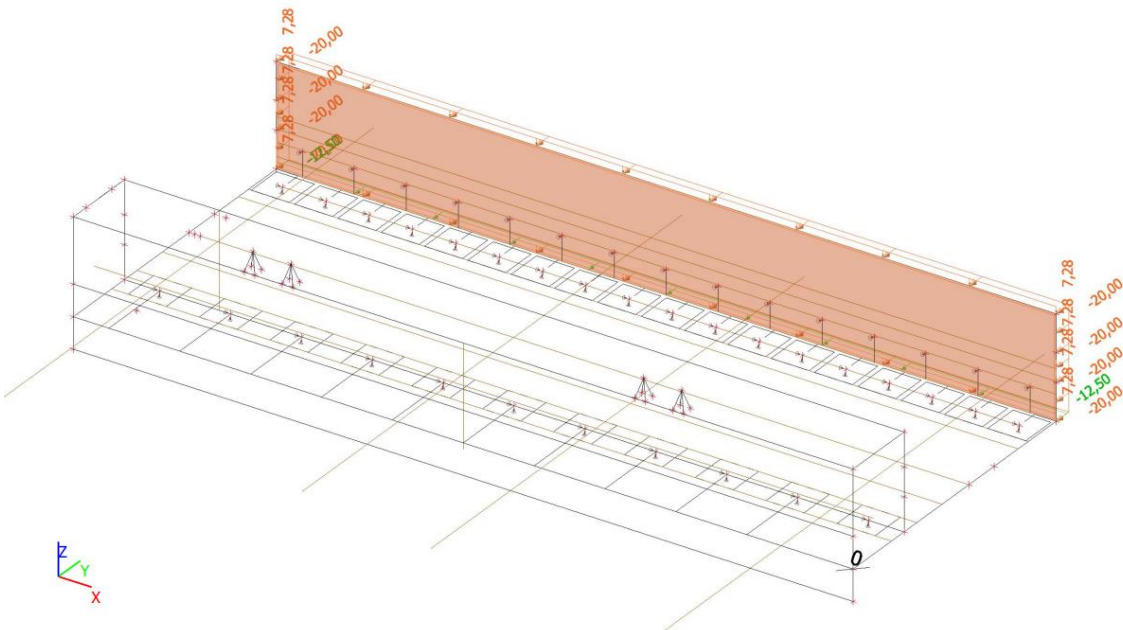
2.5D model: LC4-3- Terrain load back of the wall C
